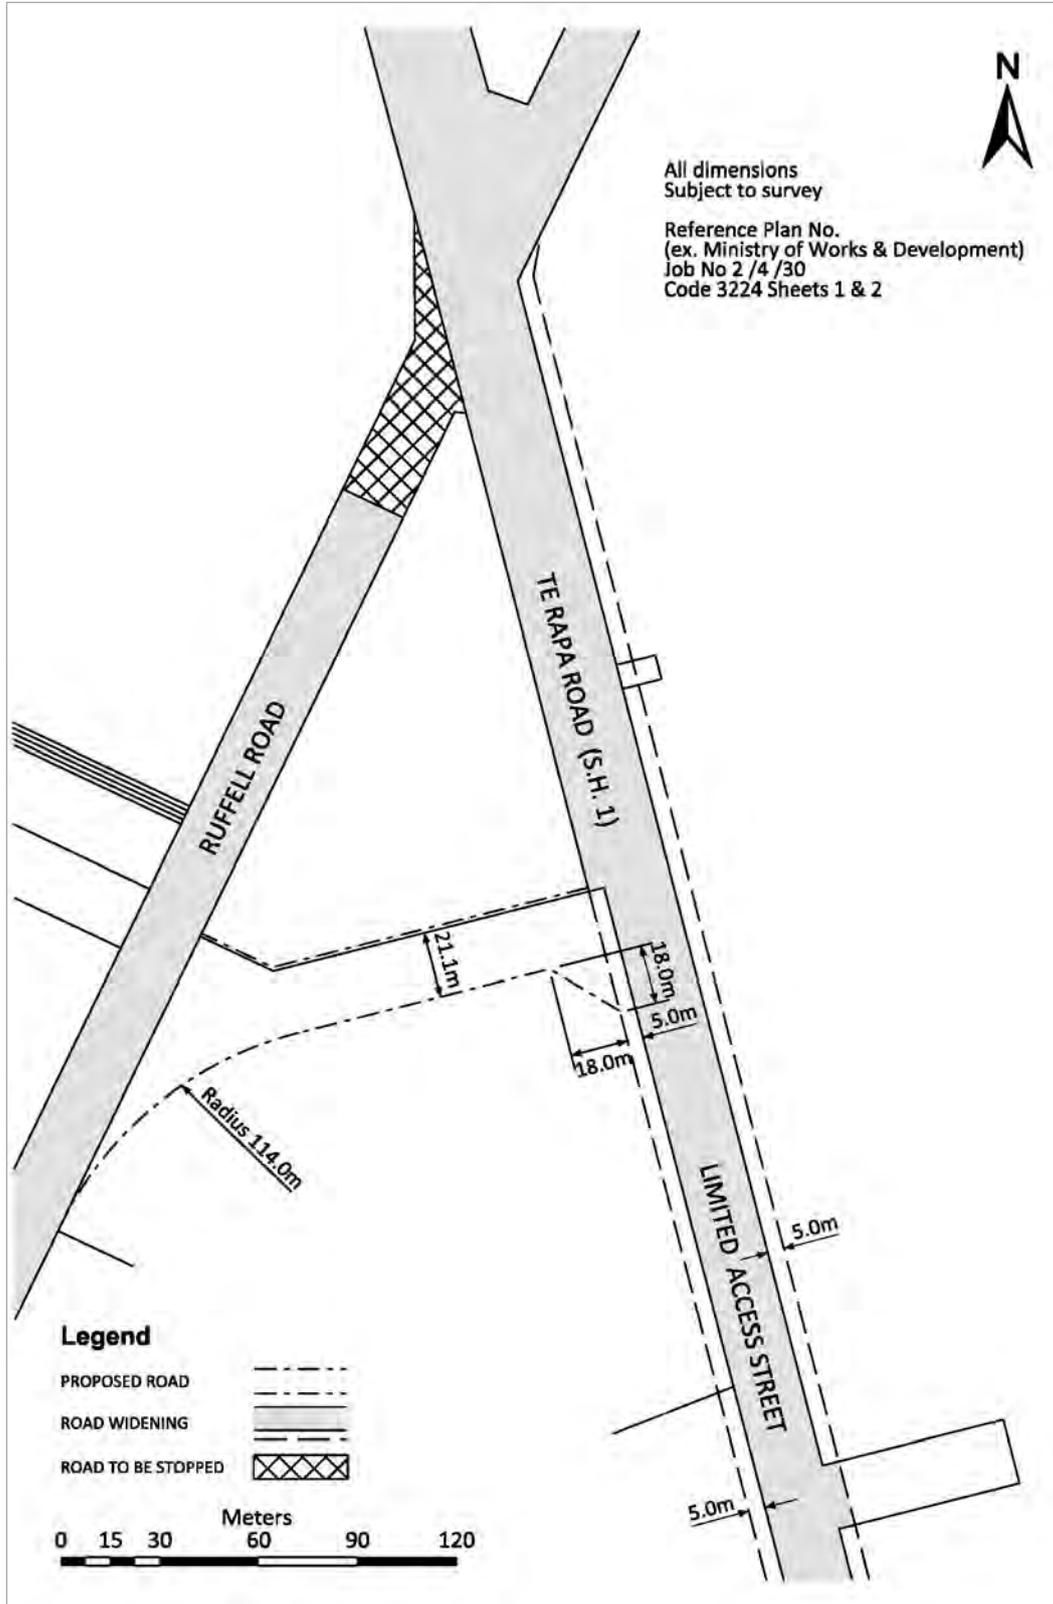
Designation E86 – Proposed Road Widening (Te Rapa Road/Ann Michelle Street)
